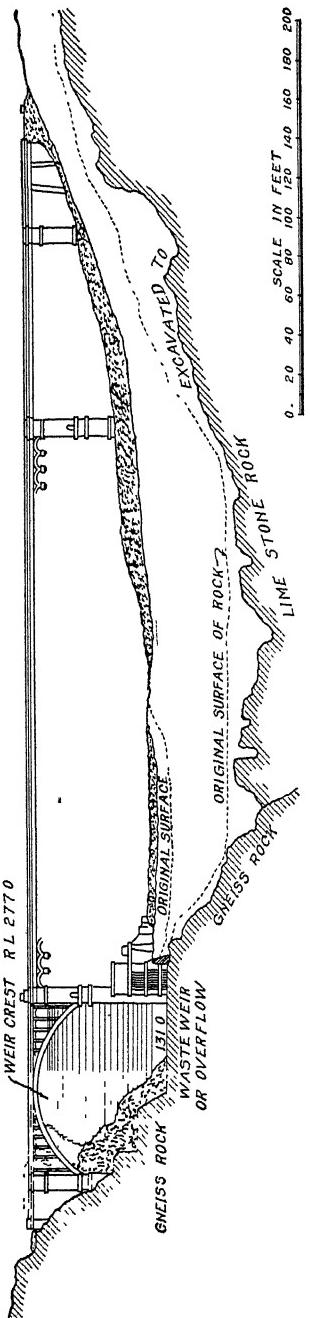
Elevation of New Croton Dam Constructed in Connection with Water Supply of New York City
